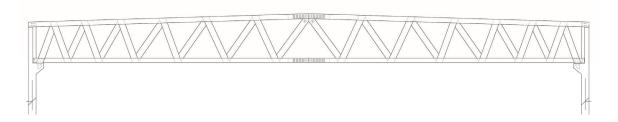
Glued timber truss - geometry of chords and diagonals, steel coupling joint, concrete columns as supporting structure
